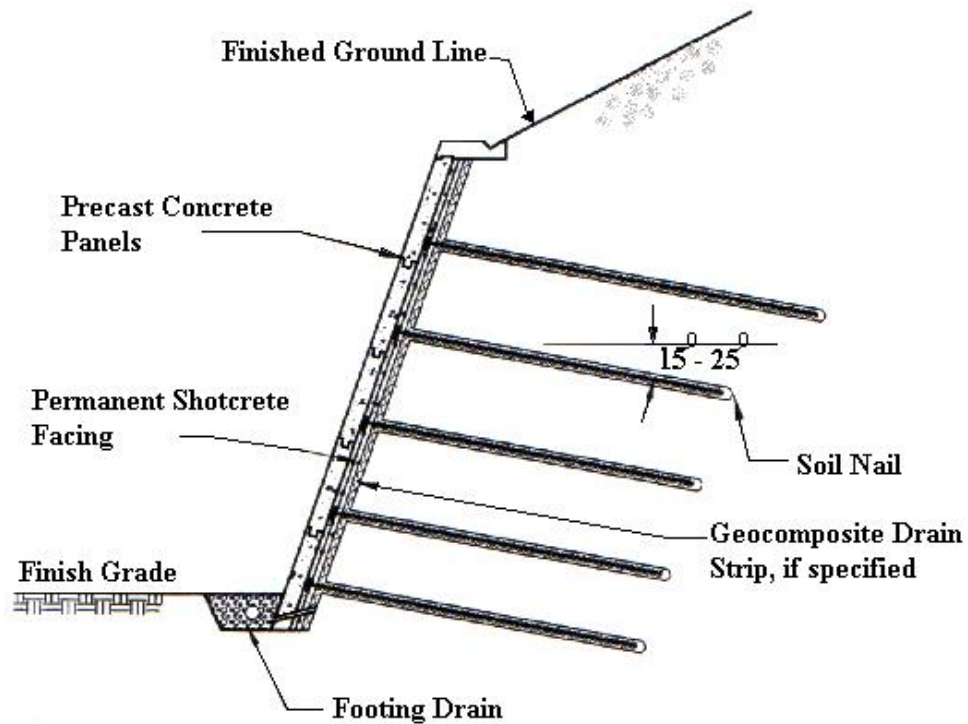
Typical architectural precast concrete panel finish face [3]
